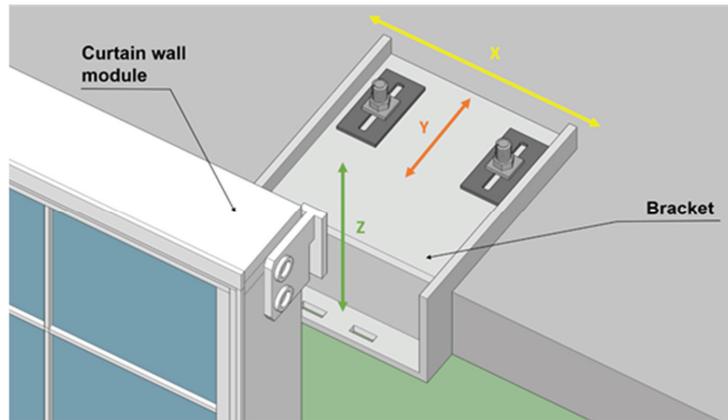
Schematic diagram of a typical bracket on the concrete building floor and its connection with a CWM module (the drilling technique).
